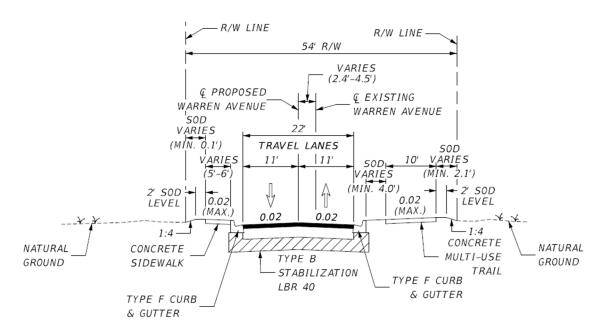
Alternative 1 Typical Section from 385 ft East of St Laurent Street to 500 ft West of Lemon Lane
